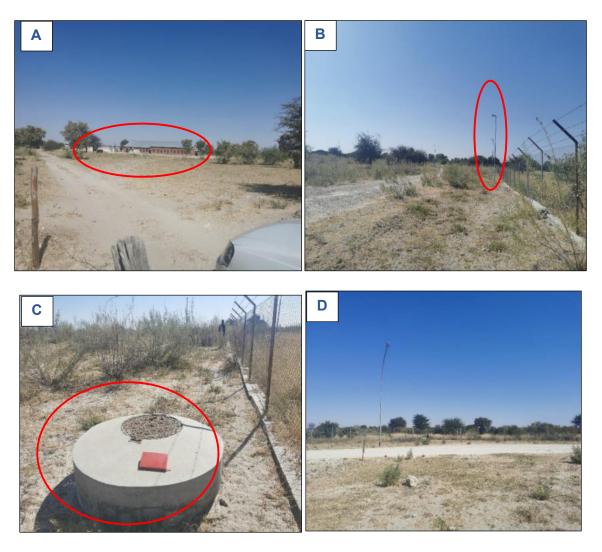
A- Omuthiya ELCIN Church, B – Street light poles at the new extension southwest of the site, C- Manhole (Sewage drain) and D – gravel road and homestead fence
